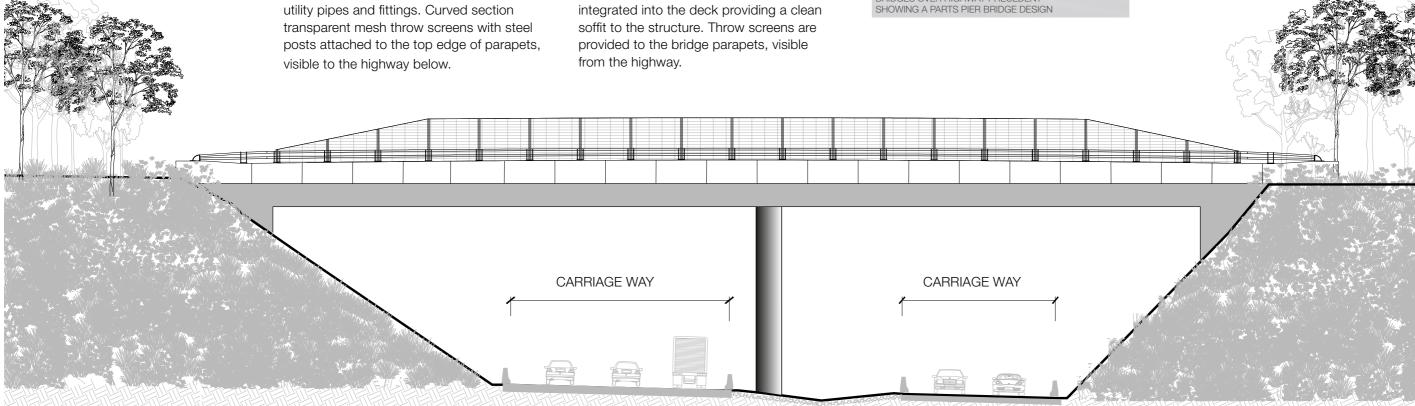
BR11 BRIDGE OVER HW10 ON SHEPHARDS LANE
